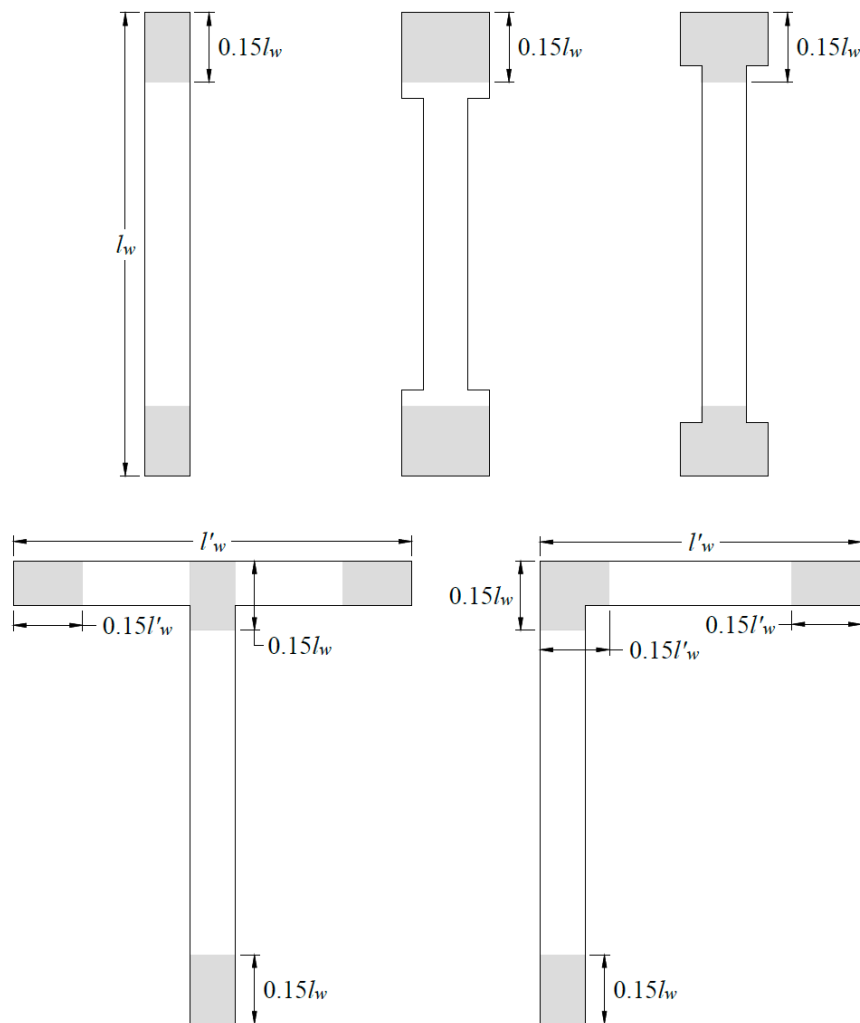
Locations of longitudinal reinforcement required by ACI 318-19 (18.10.2.4(a)) in different configurations of wall sections
